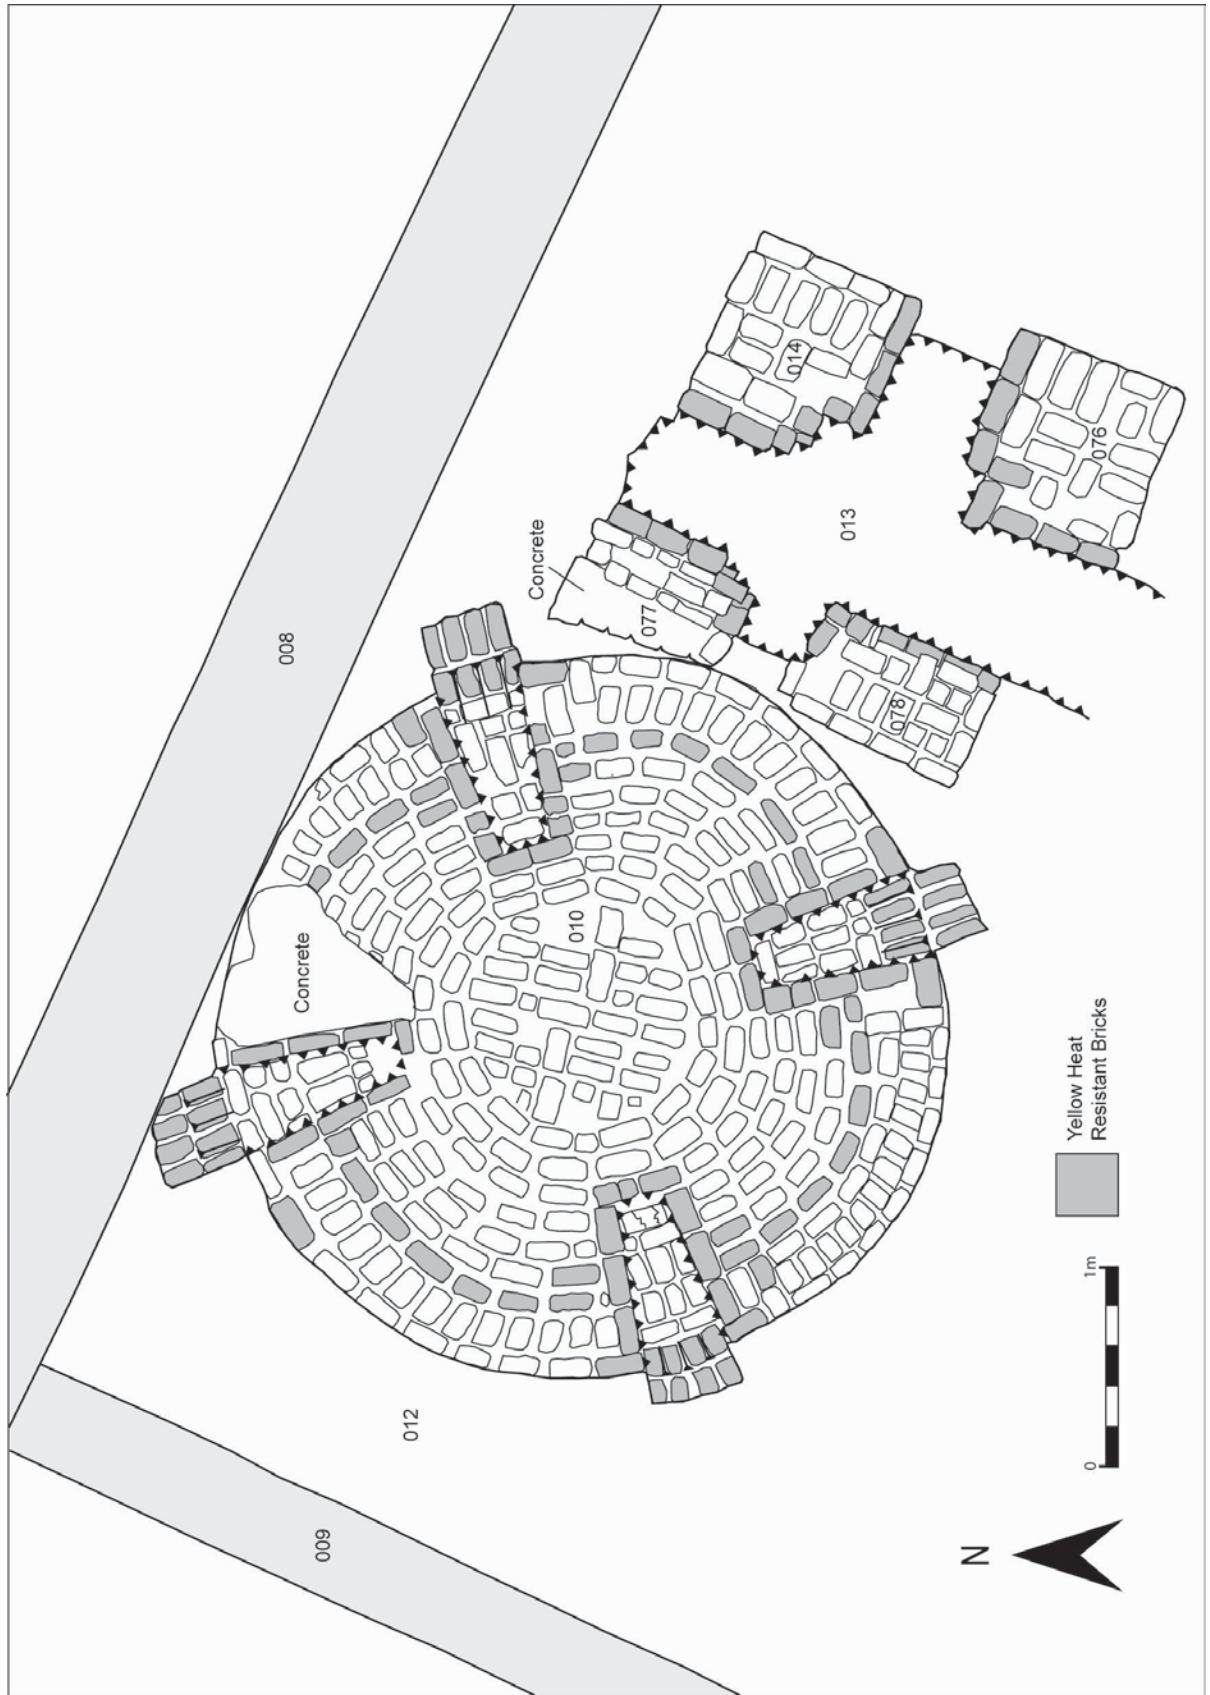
Detail of Kiln (010) and Chimney Foundations (014)(076)(077) and (078)
